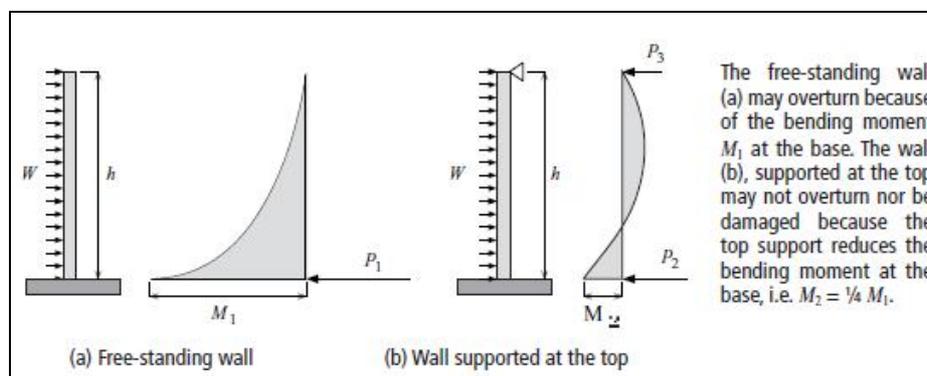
Out Of Plane Bending Moment Of A Wall Fixed At Its Base
